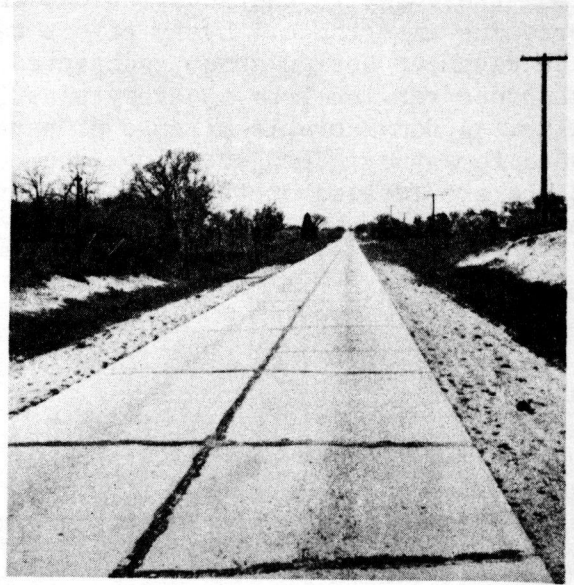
This pavement (Ill. 59A, Sec. 118) was built in 1933 on a fine grained subgrade. Traffic is comparable to that carried by the pavement in Fig. 1. Pumping is taking place at joints and cracks.
